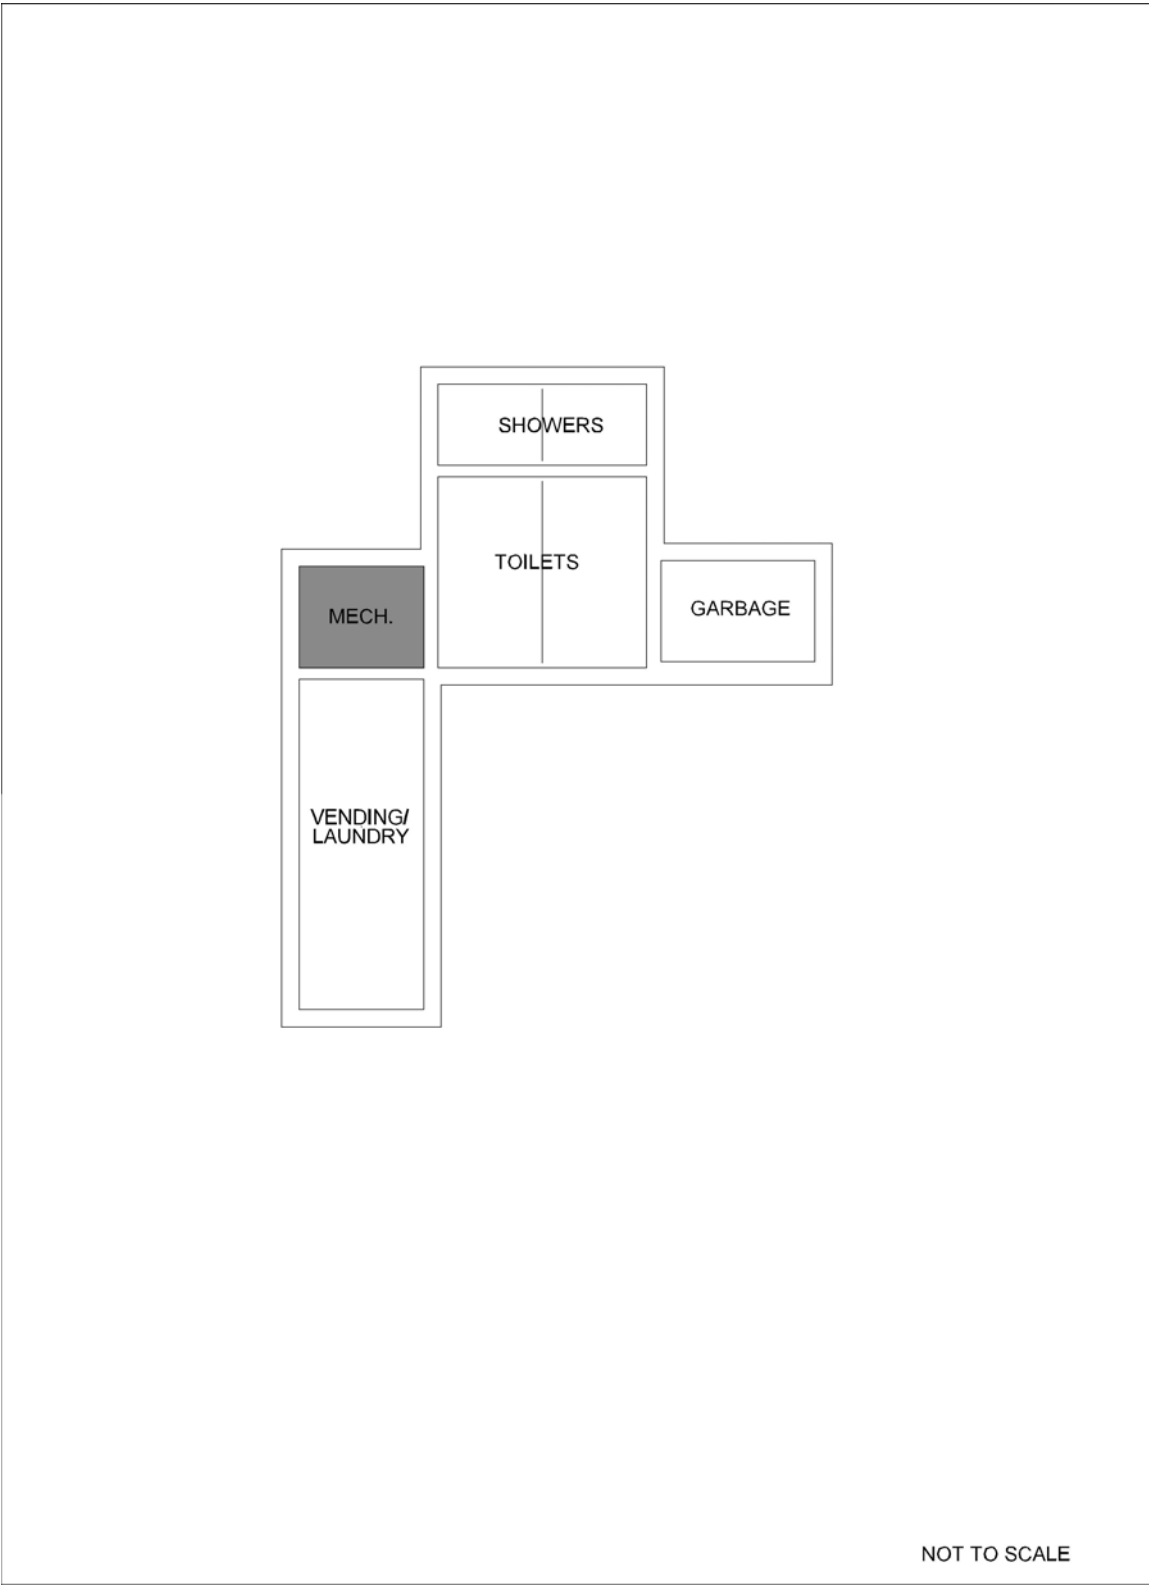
Recreational Campground – Medium Size Support Facility
